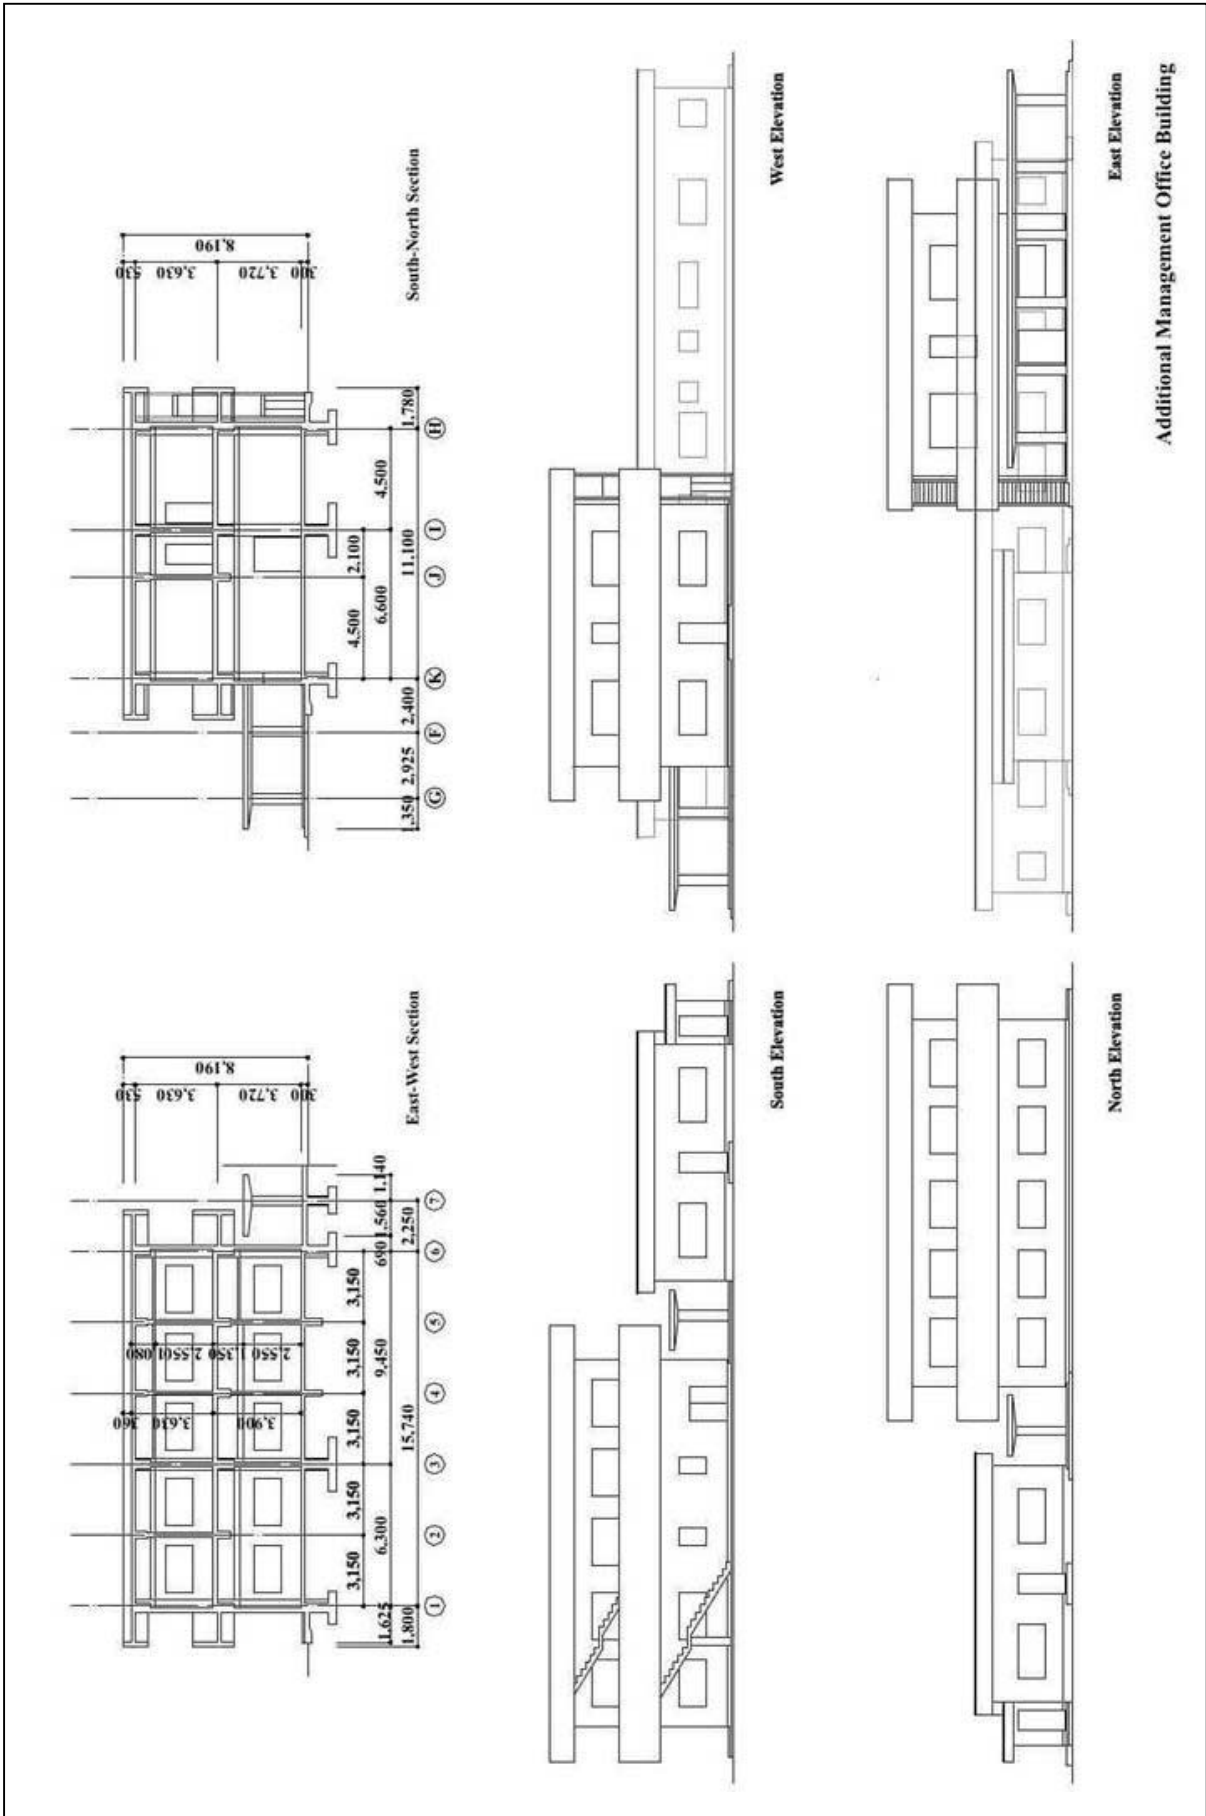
(10) Sectional Plan and Elevation of Administration Office
